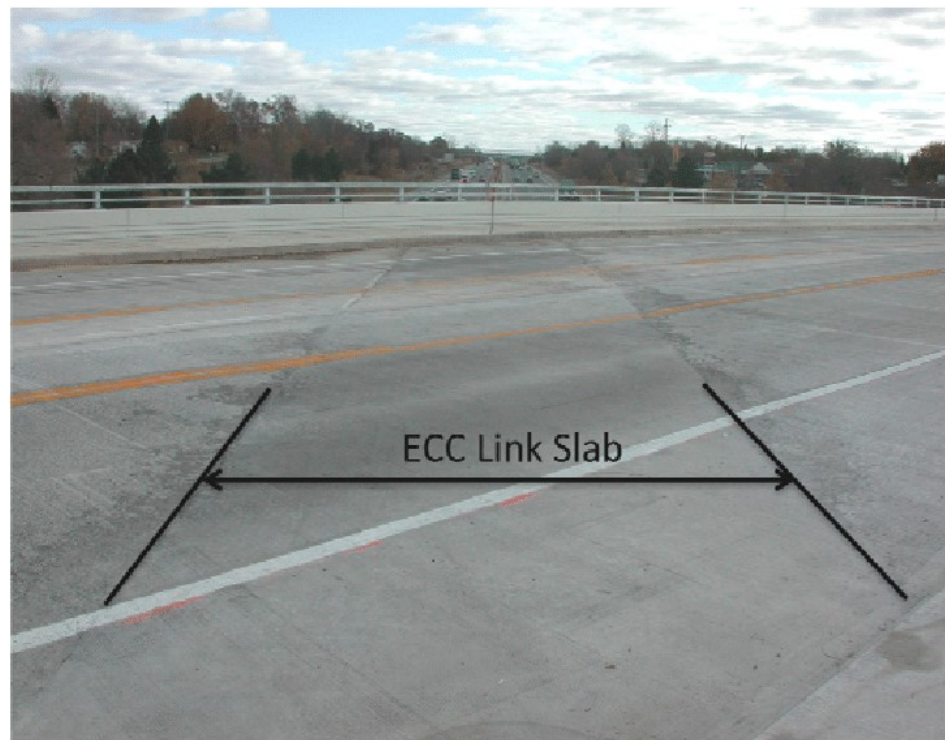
Application of ECC for Bridge Deck Link Slabs [Lepech and Li, 2009]
